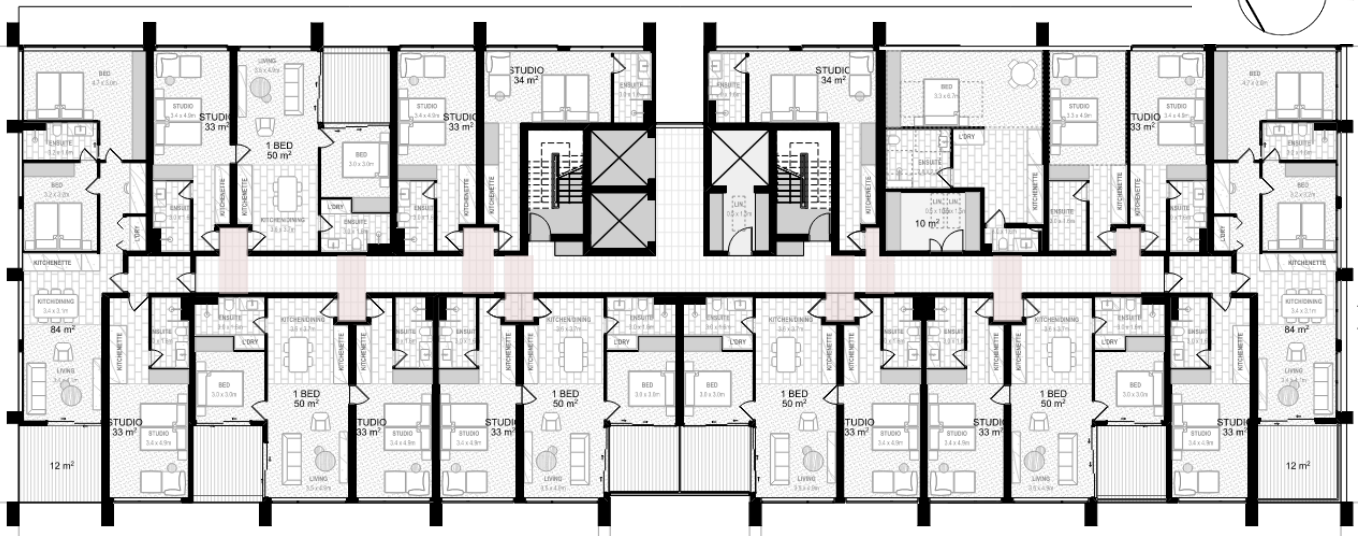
Typical proposed floor plan of the proposed development, Levels 2-7 shown.
